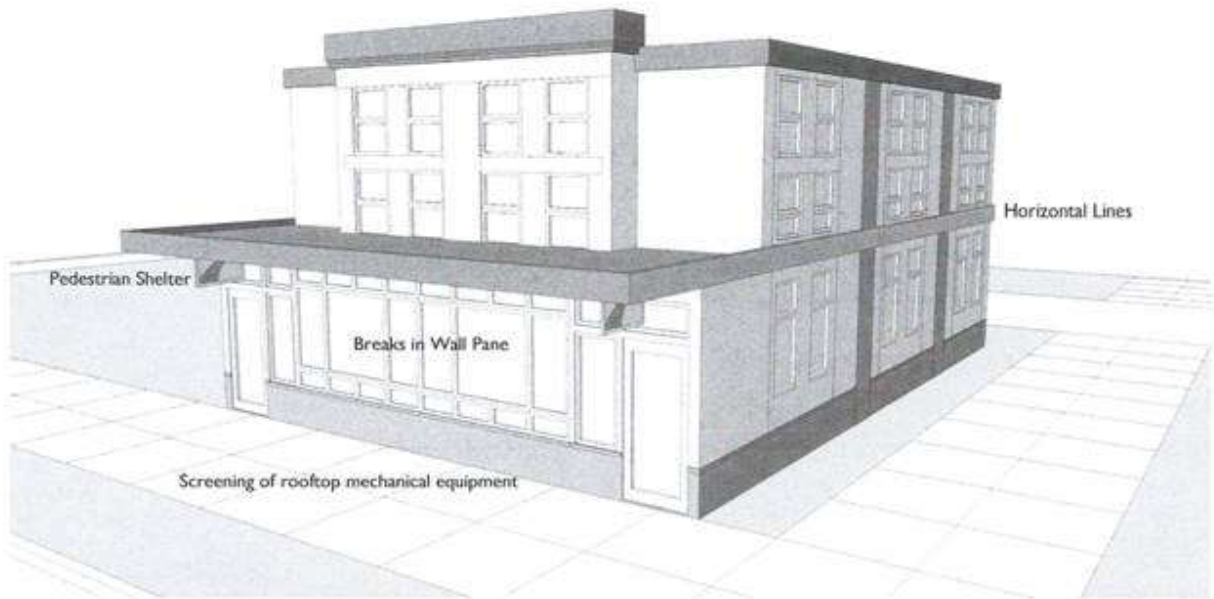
Articulation of Multi-Story Building and Typical Pedestrian Shelter
